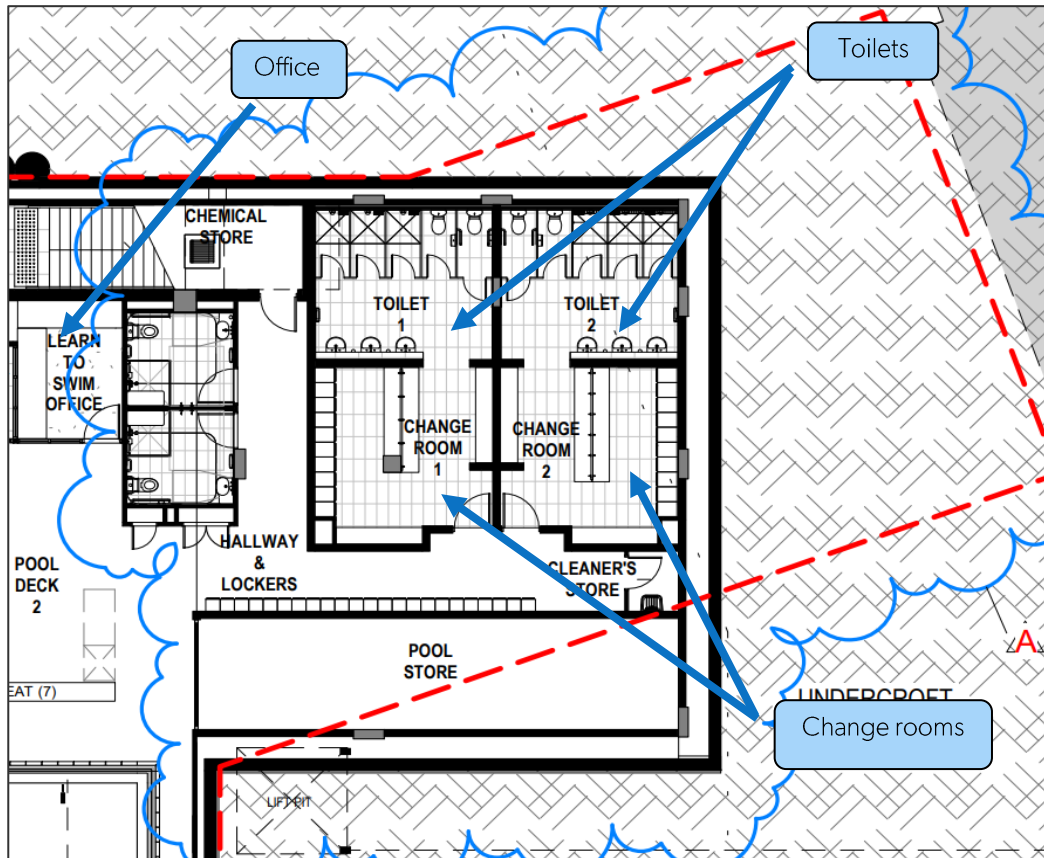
Proposed RPAC floor plan level 2 (MOD 2) (Source: Applicant's Modification Application 2019)
